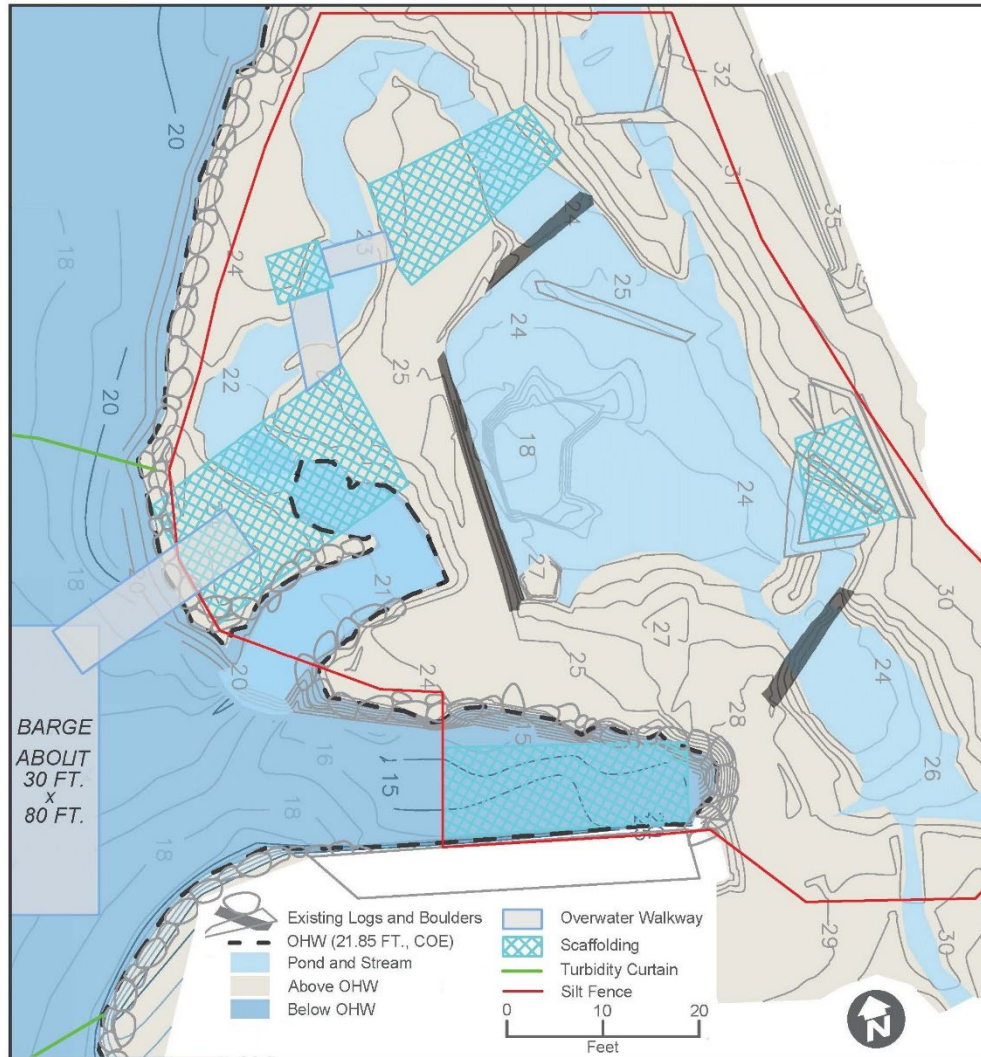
Overhead drawing showing the planned locations for the barge, ramps, scaffolds, and sediment controls to be used during the proposed weir replacement (Adapted from Page 4 of 10 in Lally 2021c).
